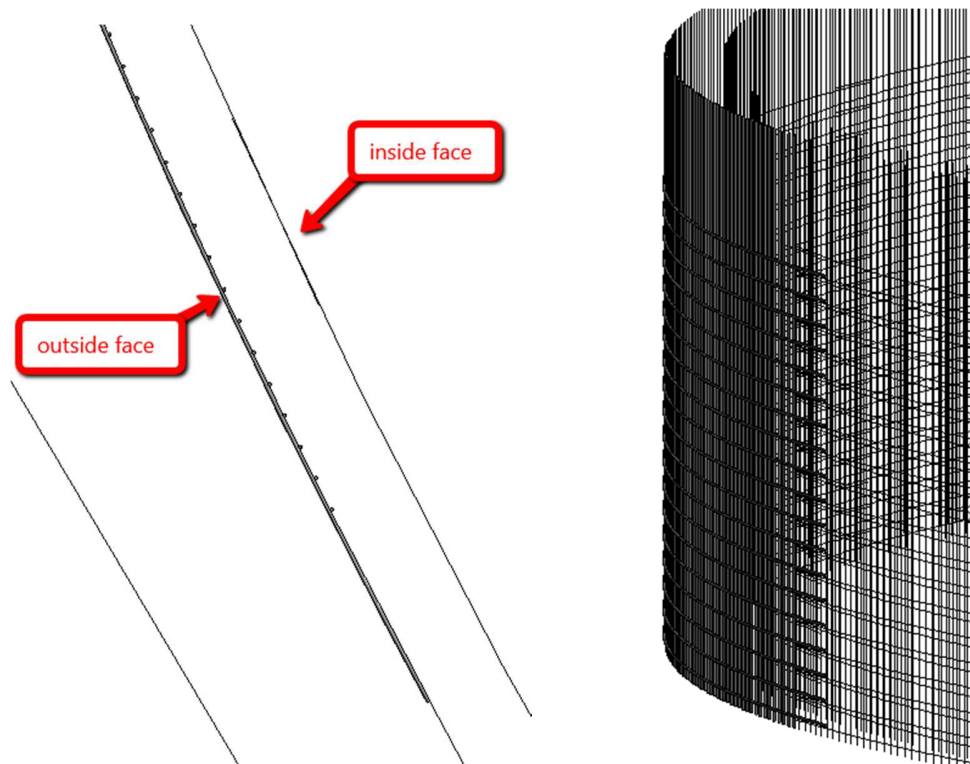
WALL HORIZONTAL & VERTICAL REINFORCEMENT
